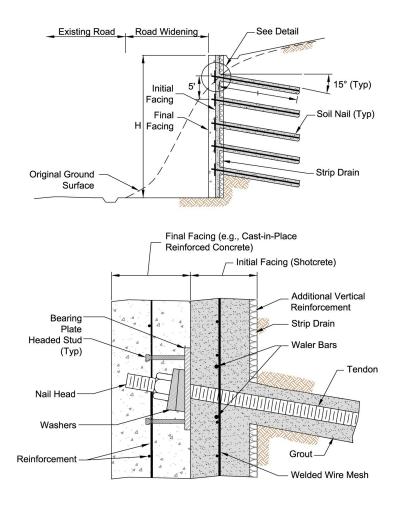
Typical cross-section of a soil nail wall. Modified after Porterfield et al. (1994).
